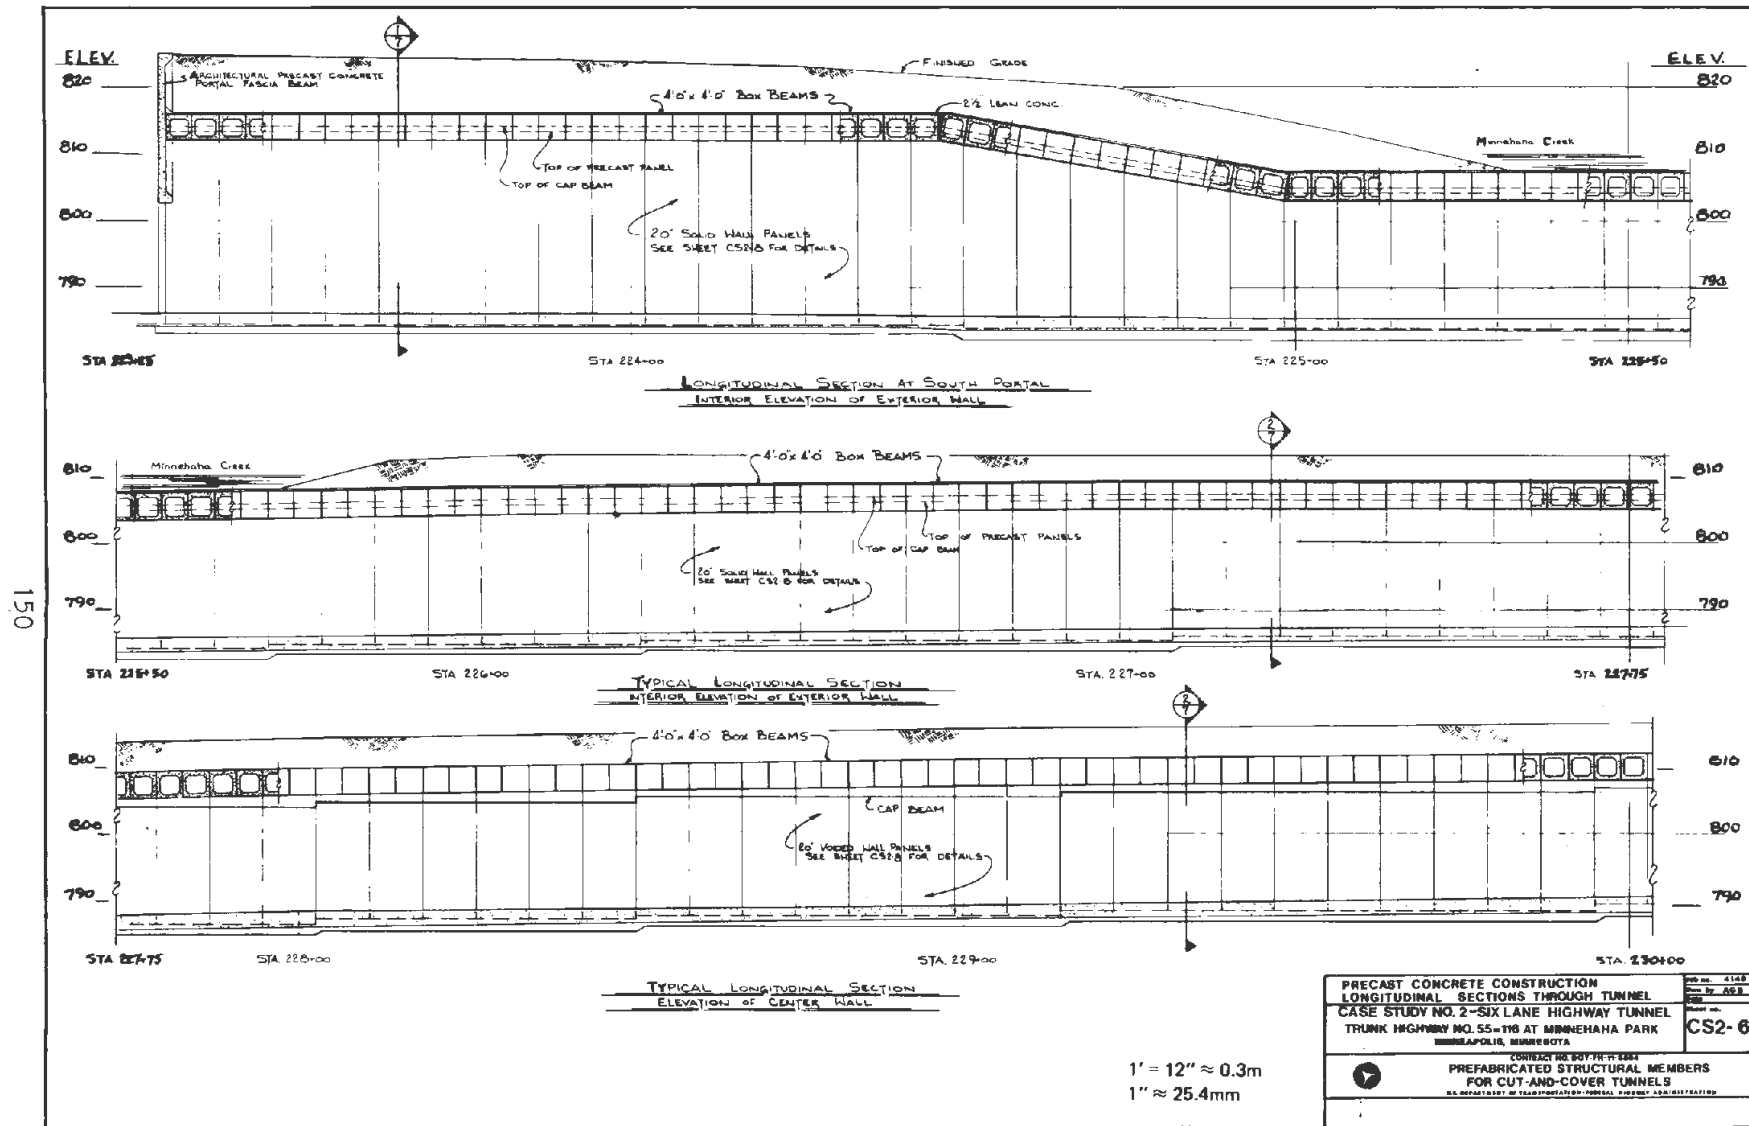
Case Study 2: Precast concrete construction. Longitudinal sections through tunnel
